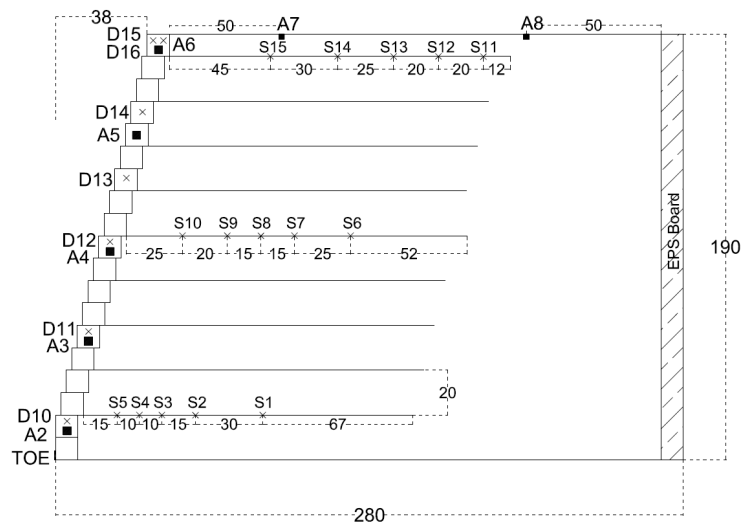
Wall Configuration and Instrumentation of Setup 1 and Setup 2.
